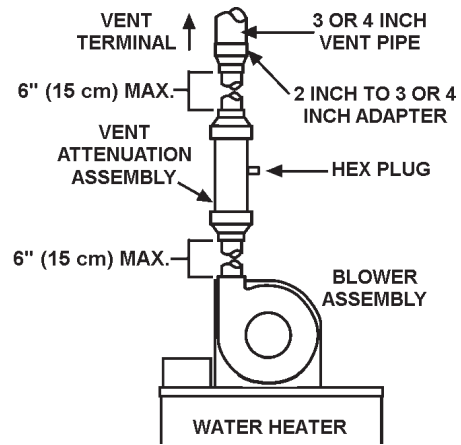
Typical Installation for Vertical Vent with 3 or 4 inch Pipe
